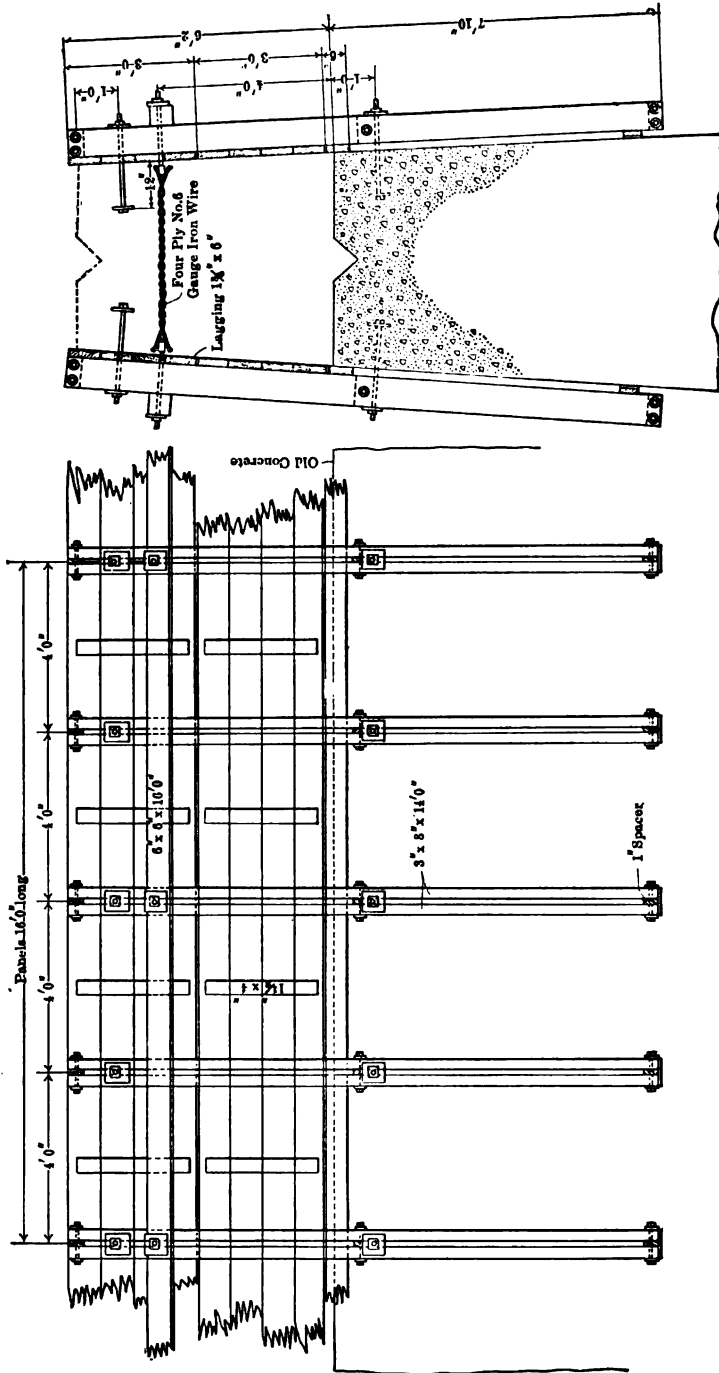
Details of Construction of Cantilever Form for Core Walls at Ashokan Reservoir. Method of Fastening and Using Forms.
